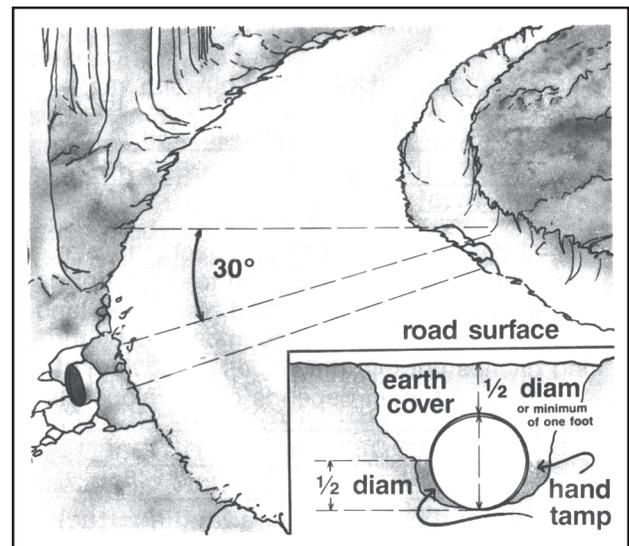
Design and installation of relief culvert (Vermont DFPR, 1987).
